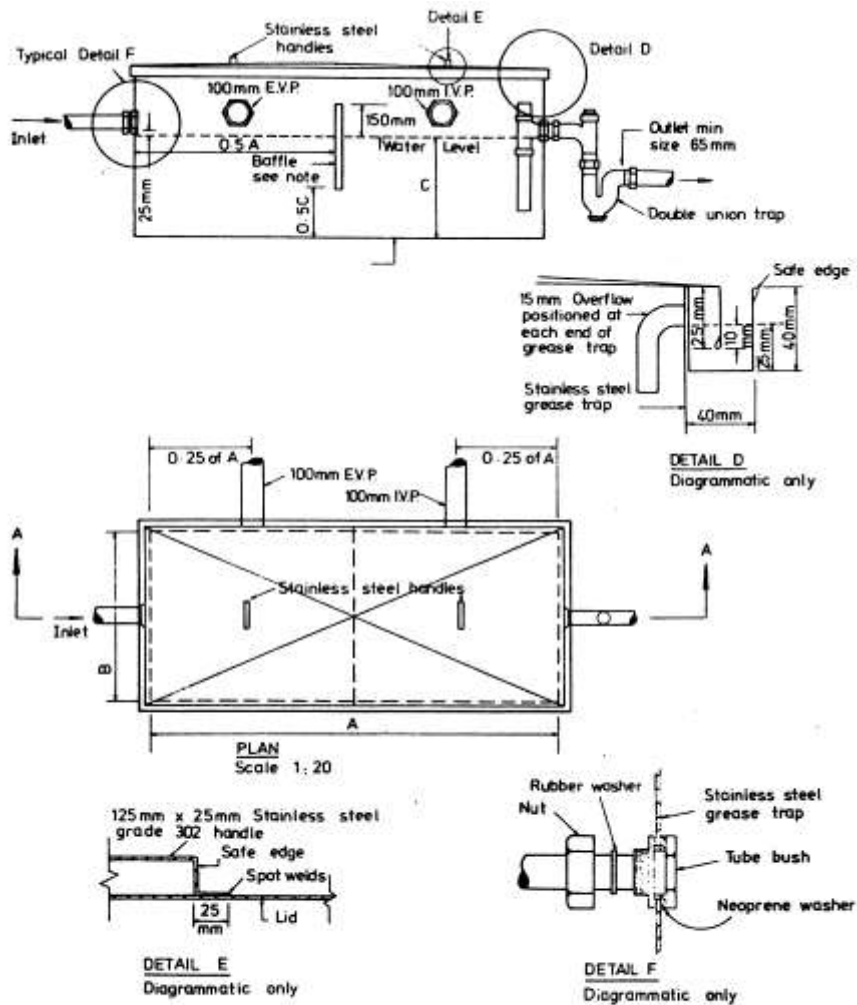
PREFABRICATED GREASE TRAP CONSTRUCTION.
